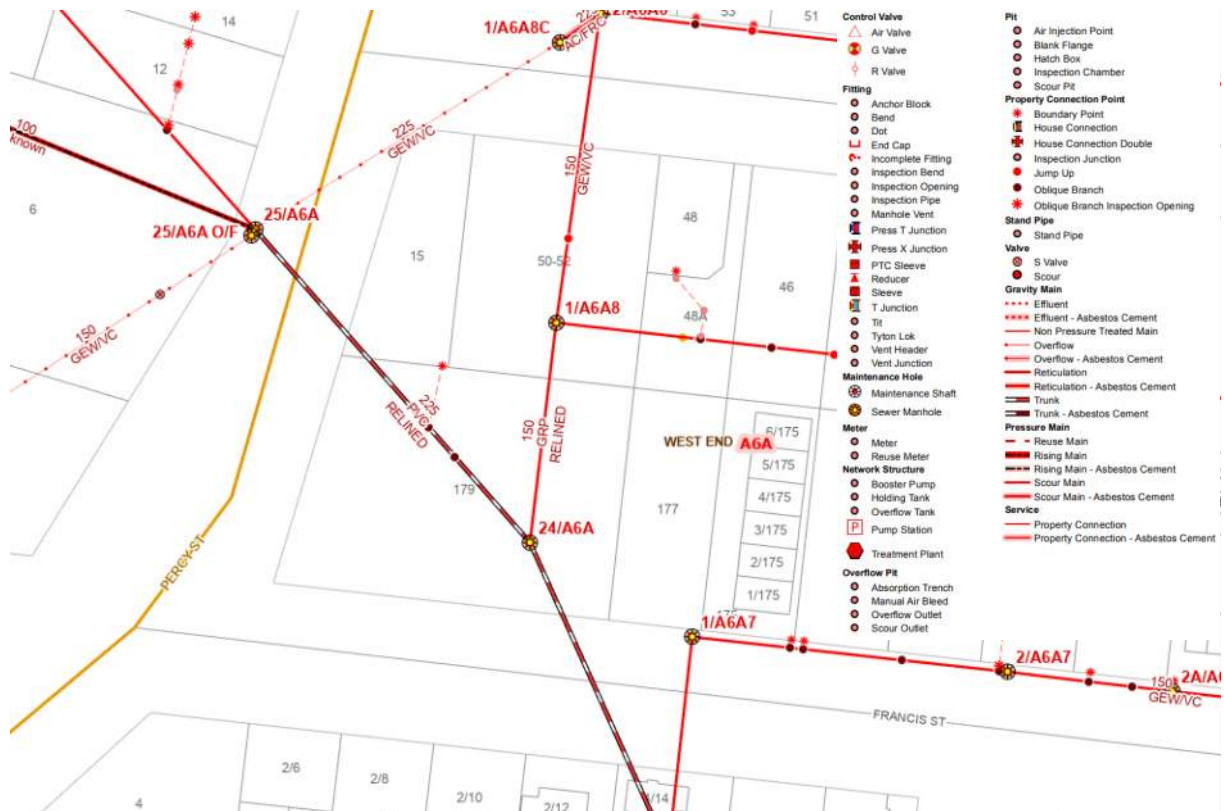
Existing Sewer Layout (TCC Mapping)
